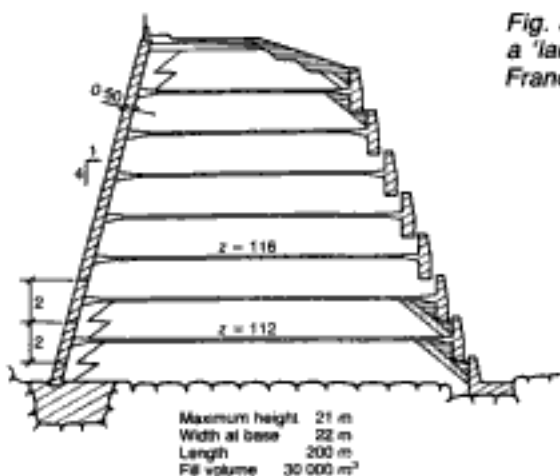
Cross-section of a 'ladder wall' at Conqueyrac, France (Chabal et al.¹²)
